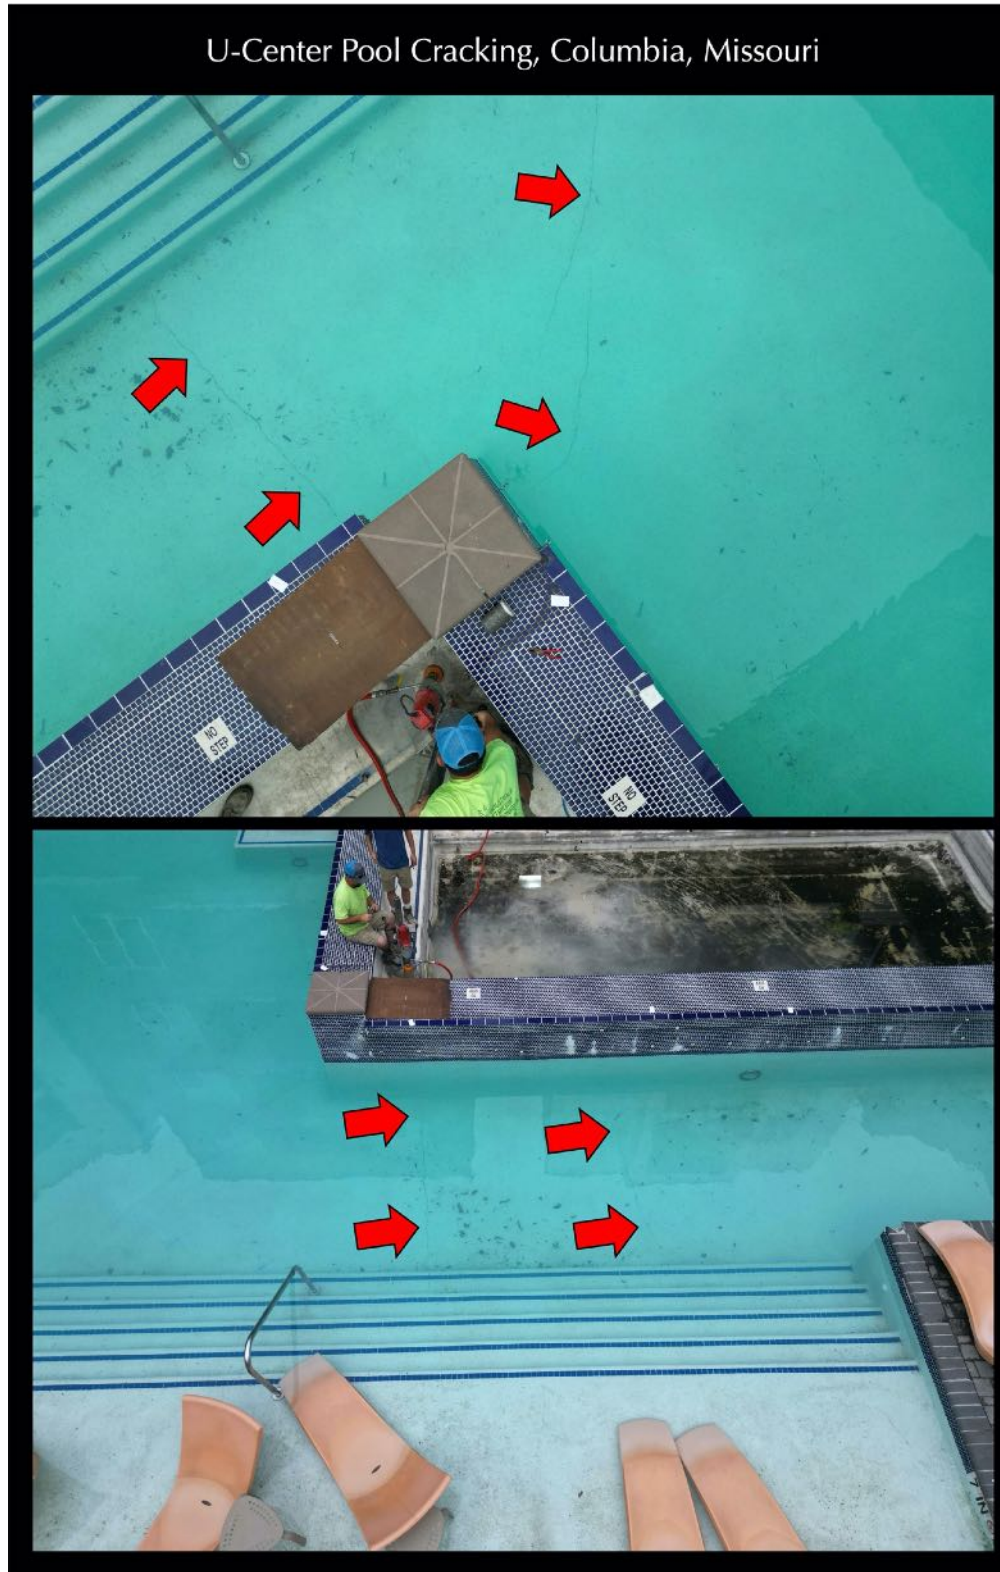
Cracks (marked by red arrows) on pool floor seen under water. Cracks are long, continuous and occurred at various locations as shown in subsequent field photos.
